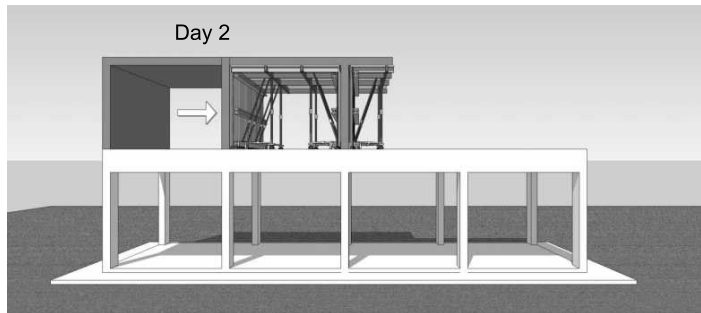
Heating Equipment in Position for the Tunnel Formwork.
